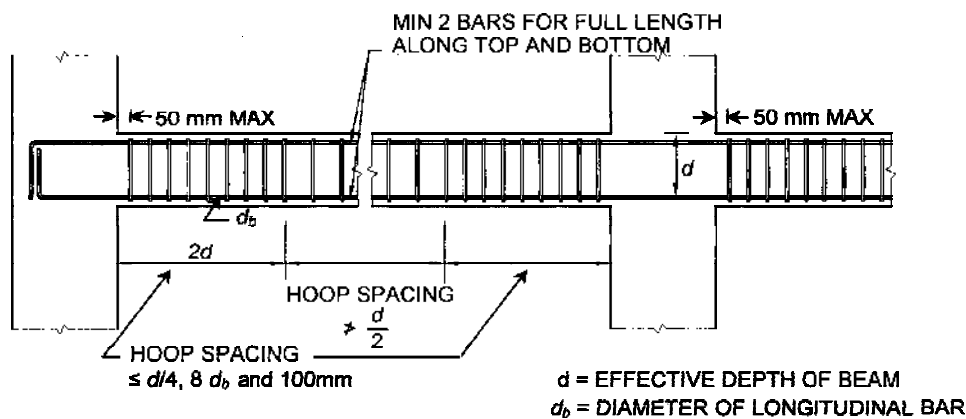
DETAILS OF TRANSVERSE REINFORCEMENT IN BEAMS
